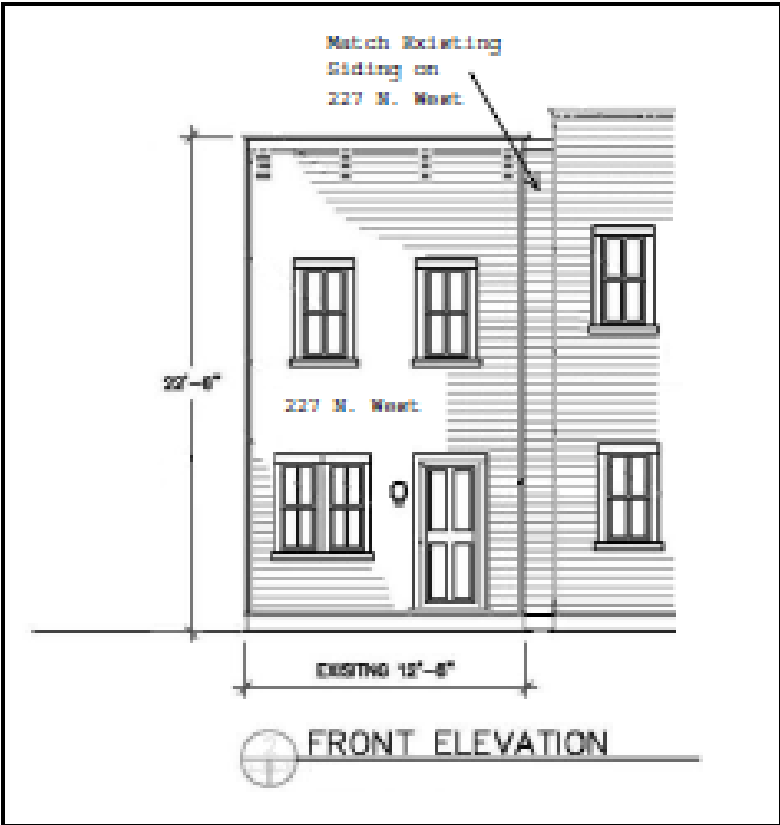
Front elevation of 225 and 227 North West Streets showing new hyphen/screen wall.
